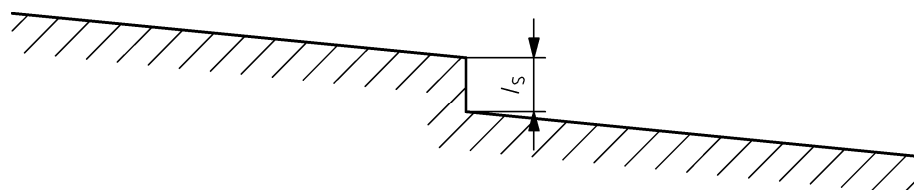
Transverse profile of a pavement surface showing step height I_S
